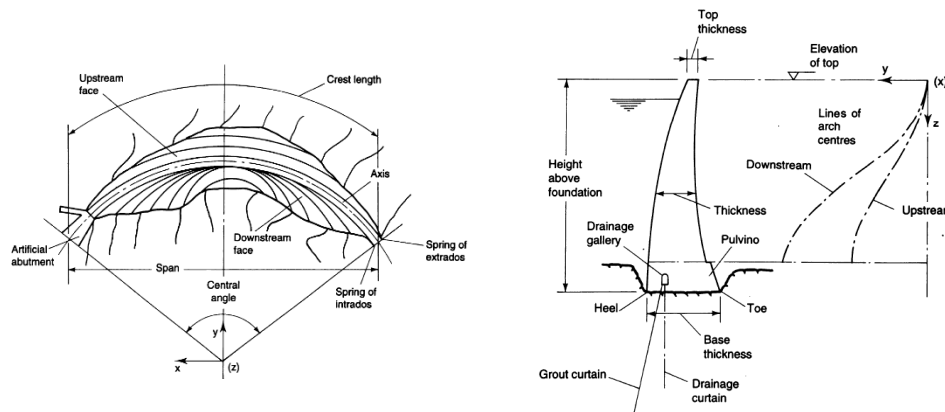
Arch dam terminology: a) Plan view; b) Central Cantilever. Adapted from (Pedro, 1999).
